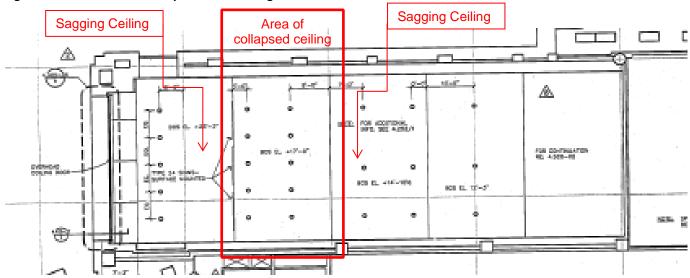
14th Street North Ramp Reflected Ceiling Plan – Concourse Level
